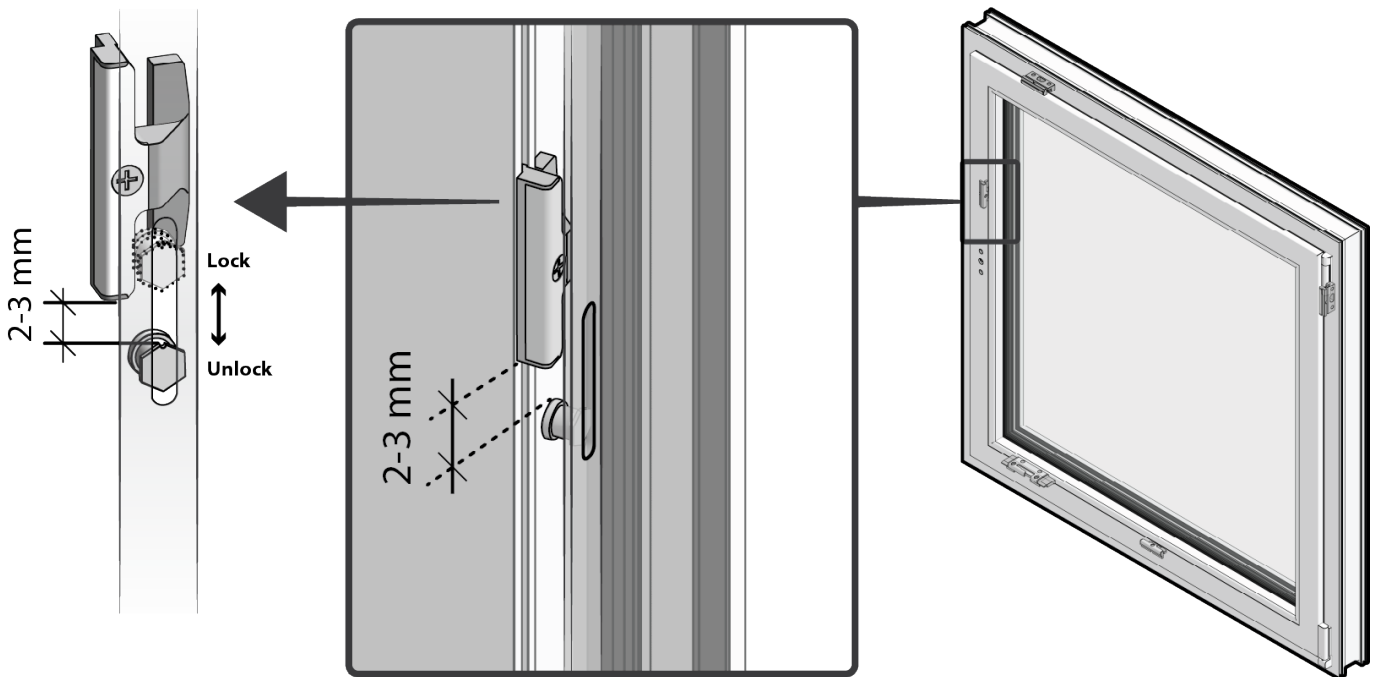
Checking CAM to Keeper Clearance – Sash shown transparent and the distance is exaggerated for clearance.
